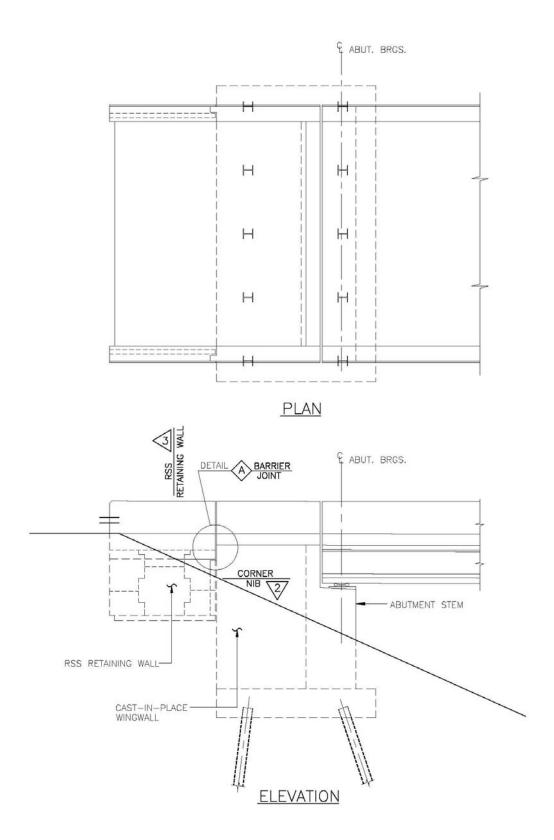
Conventional Abutment with RSS Retaining Walls (in line with wingwalls). For Section 2 and 3, see Figures 5.12 and 5.1 respectively. For Detail A, see Figure 5.14.
